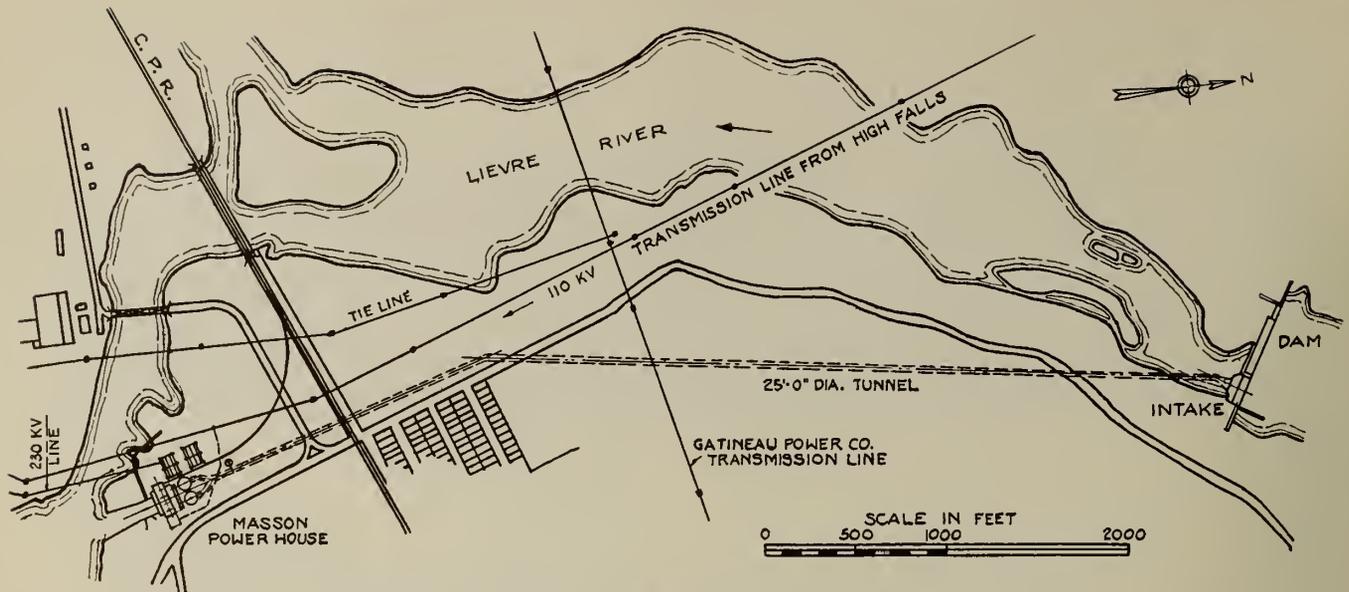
Plan Showing Location of Intake, Tunnel and Power House at Masson.
